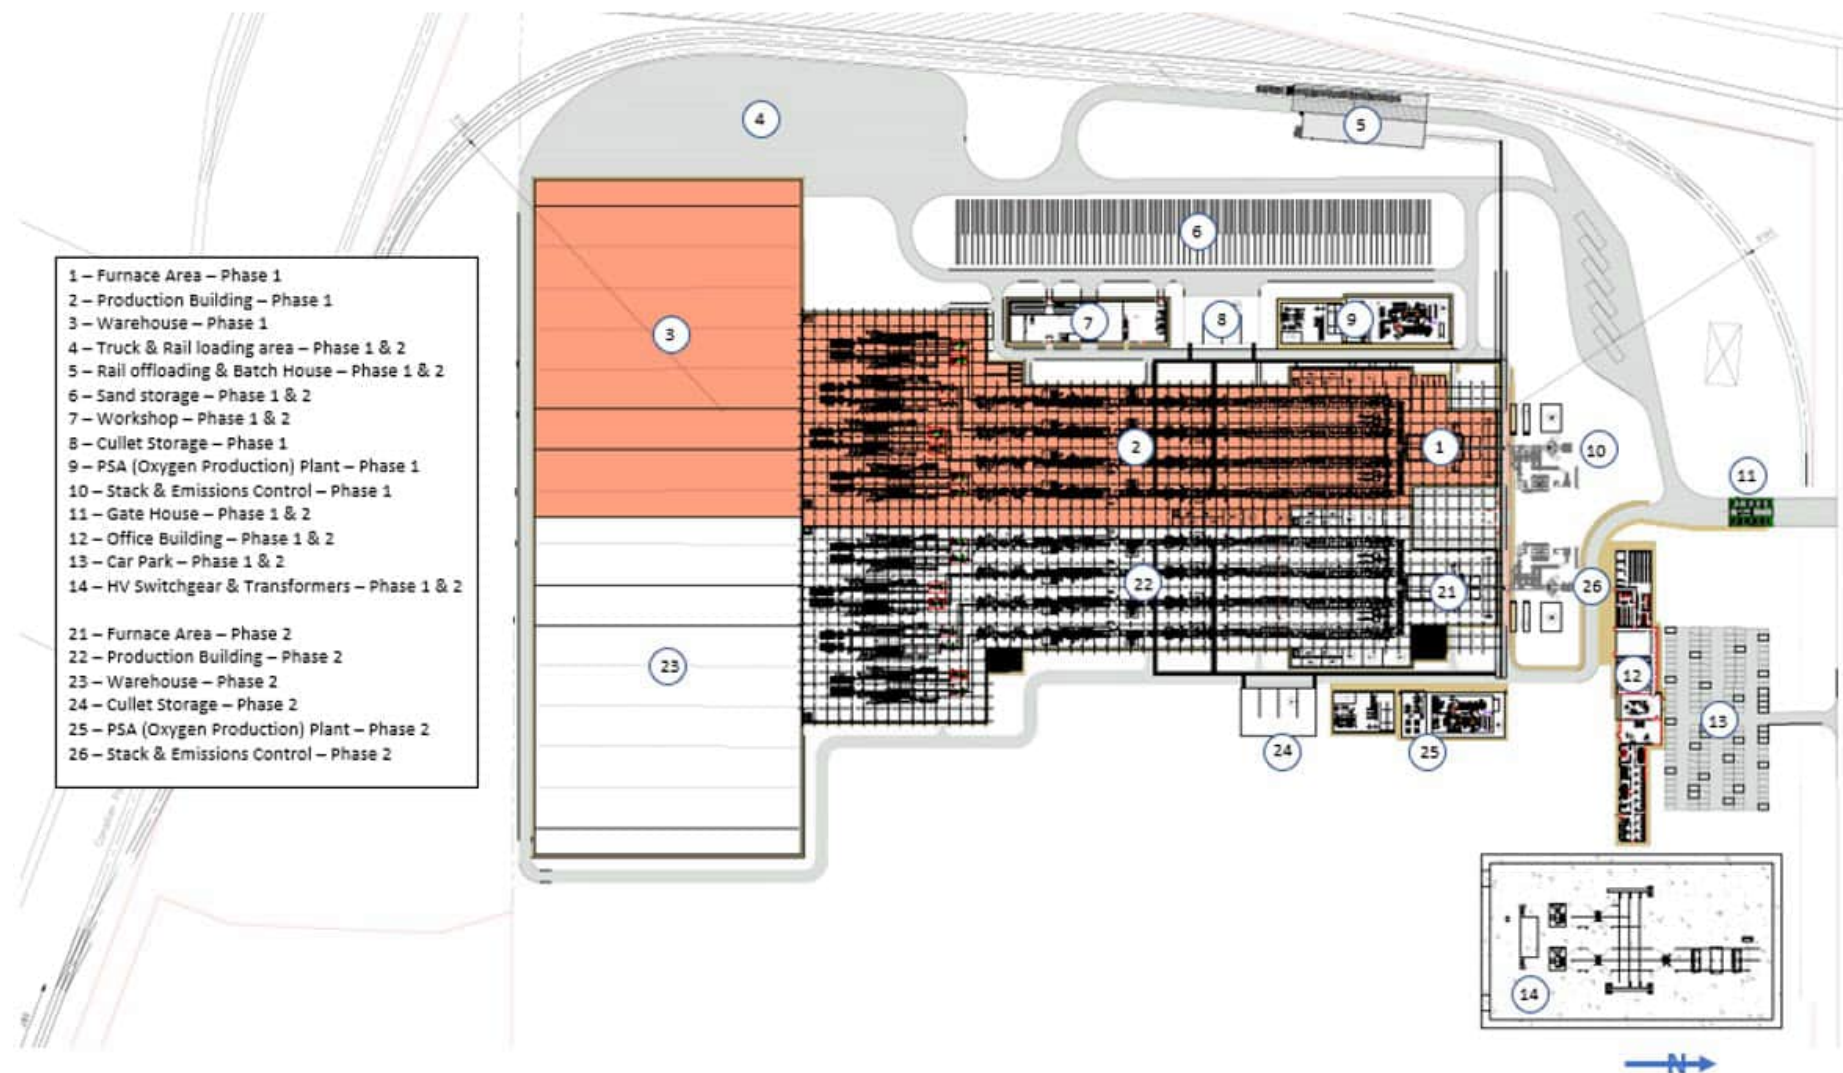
Conceptual Layout of Buildings and Ancillary Structures Comprising the Facility
